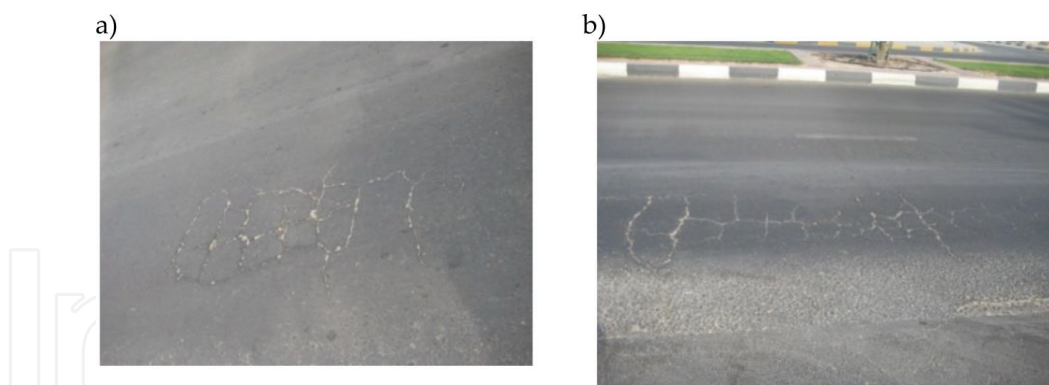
Fatigue failure of asphalt concrete pavement: alligator cracks (Sharjah city, United Arab Emirates, August, 2010).
